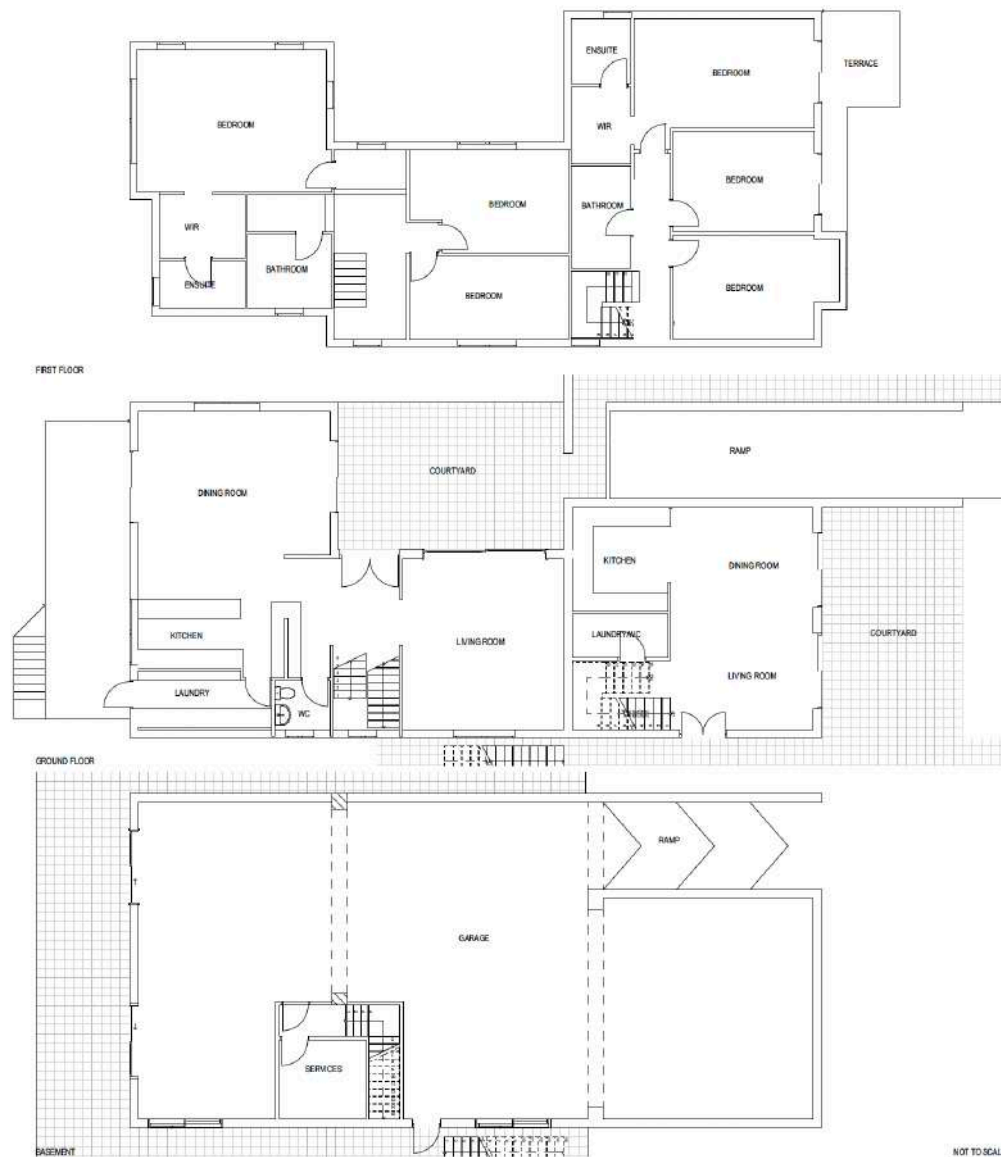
The approximate floor plans of the basement, ground floor and first floor of No.27 Dover Road. Weir Phillips Heritage, 2025.
